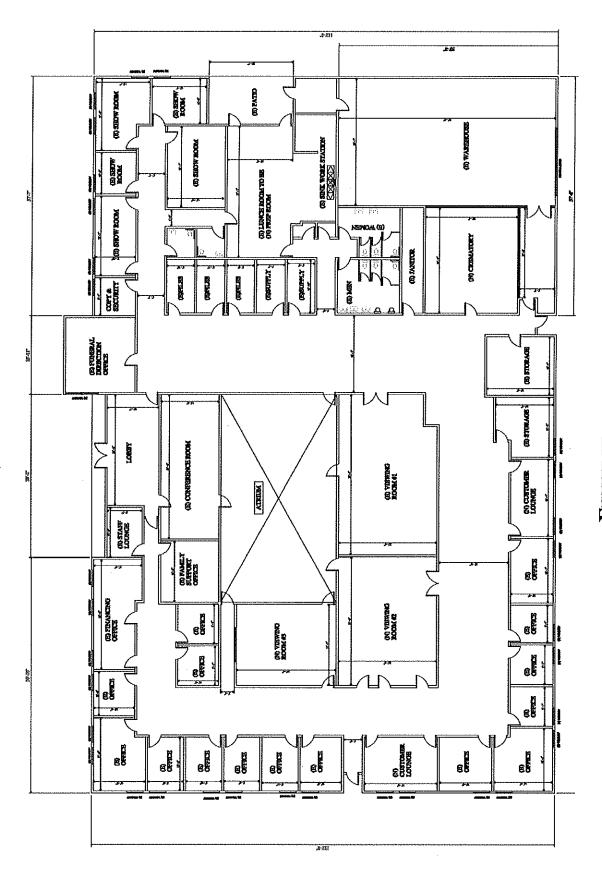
FLOOR PLAN SOURCE: TRAN DESIGN
